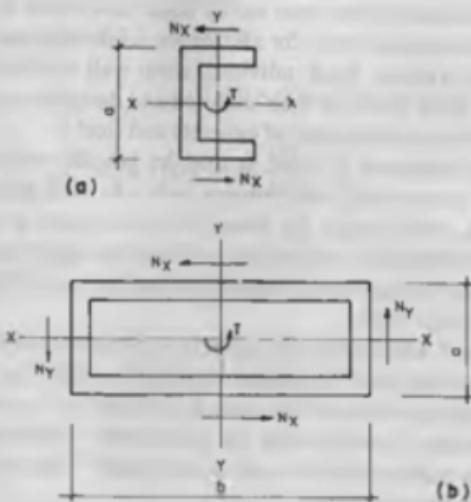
Flange forces in wall sections under torsion. (a) Open section; (b) Closed section.
